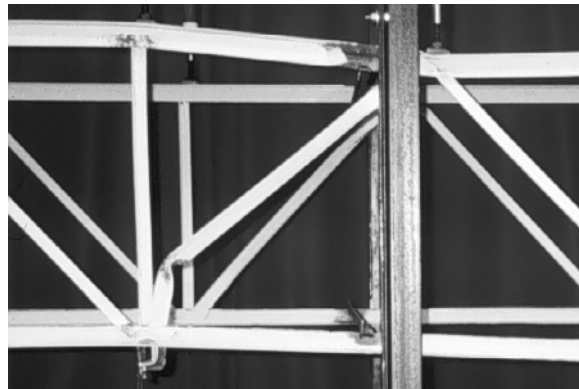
Failure Mode for 26K5-ND West Joist
